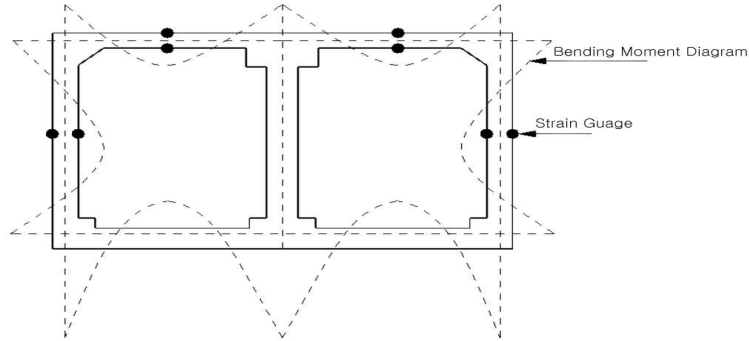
Opening tunnel(main line box structure) monitoring location example
